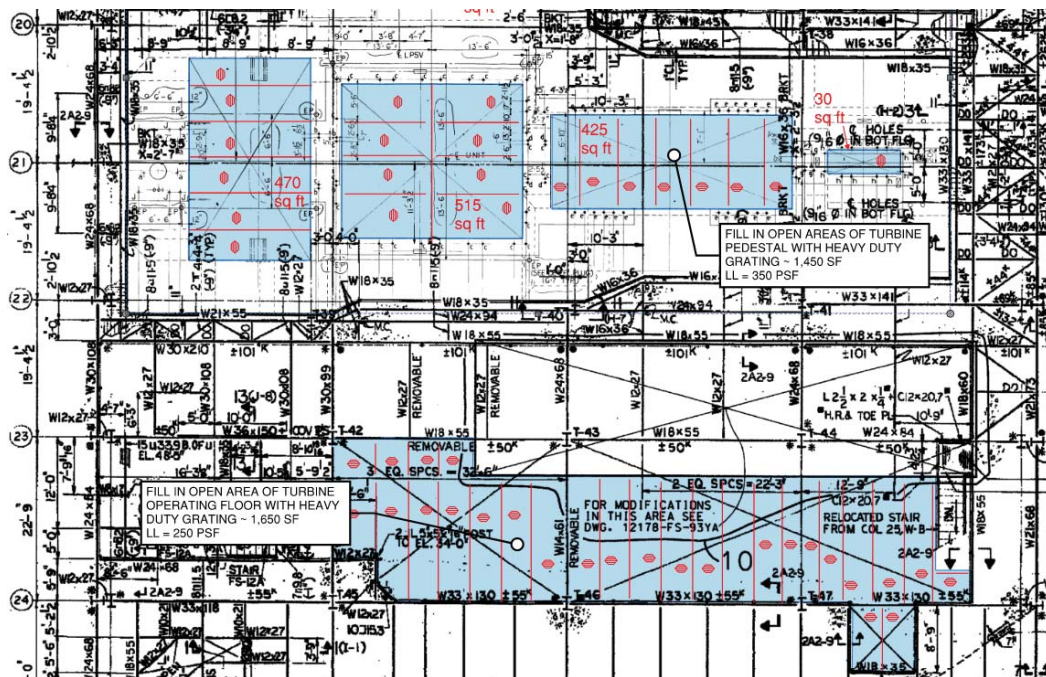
Turbine Building Operating Floor In-Fill Areas
